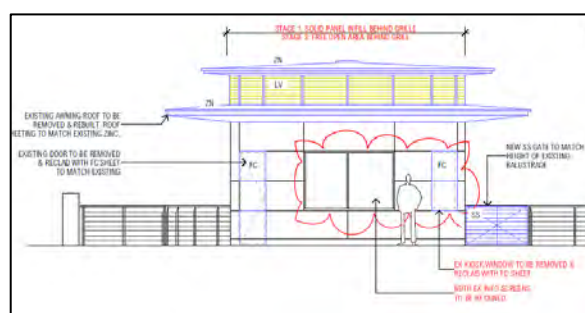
Approved beach elevation of Lifeguard Tower, Tunnel 2 and Amenities block.
